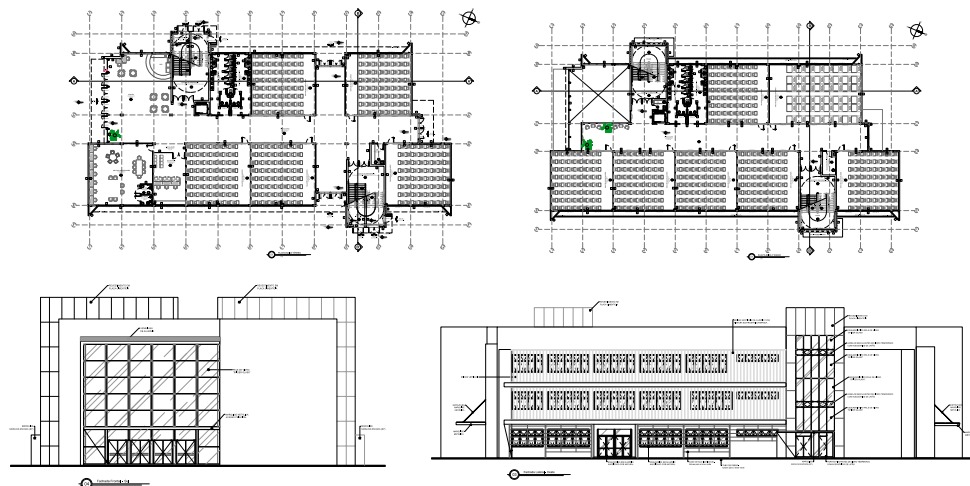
V2. Ground and 2nd Floor Plans; South and East Façade. Source: Setor de Projetos UPF, 2014.
